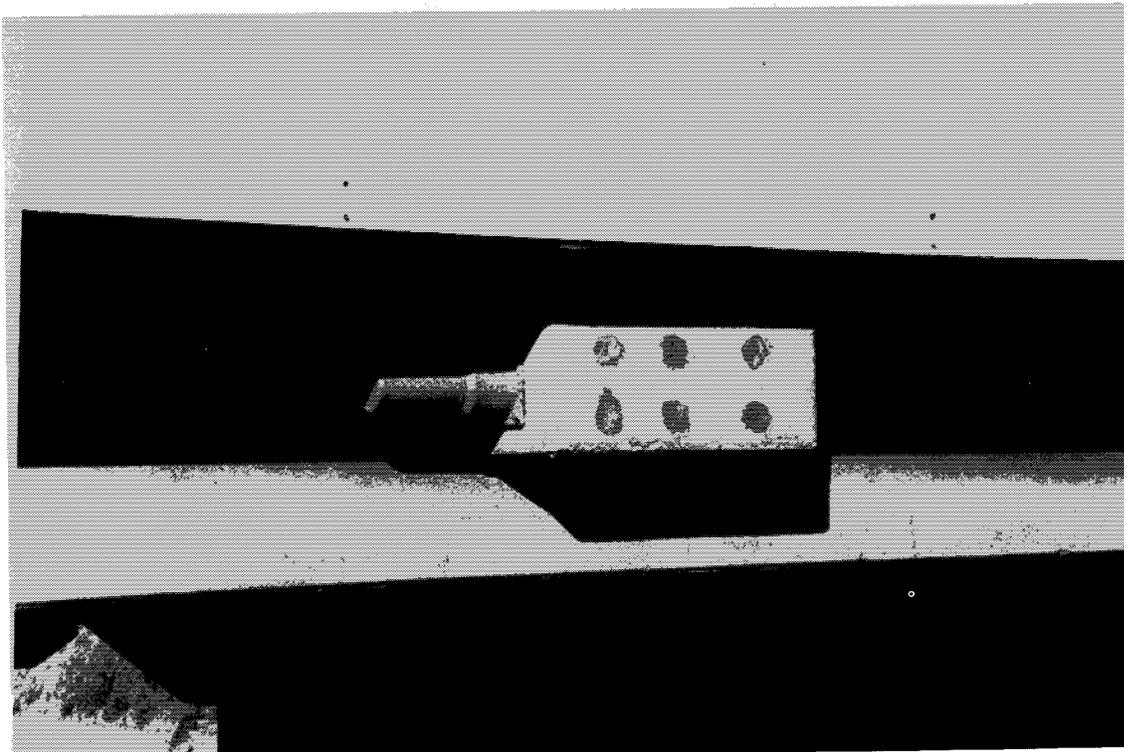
External Anchor Block Stressed to the Girder With Six Technora® Tendons
